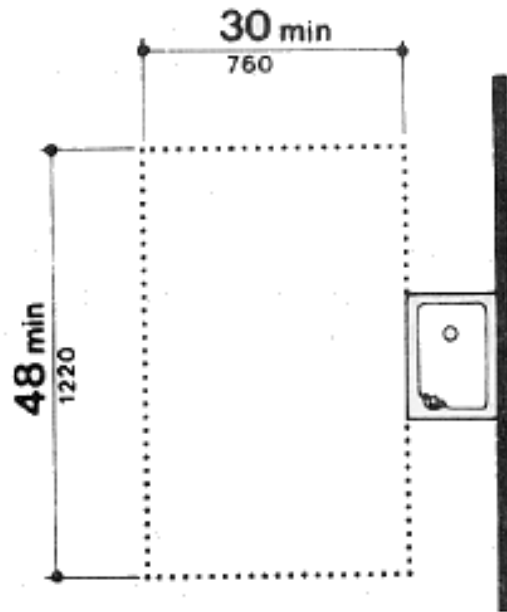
Drinking Fountains and Water Coolers - Built-In Fountain or Cooler
